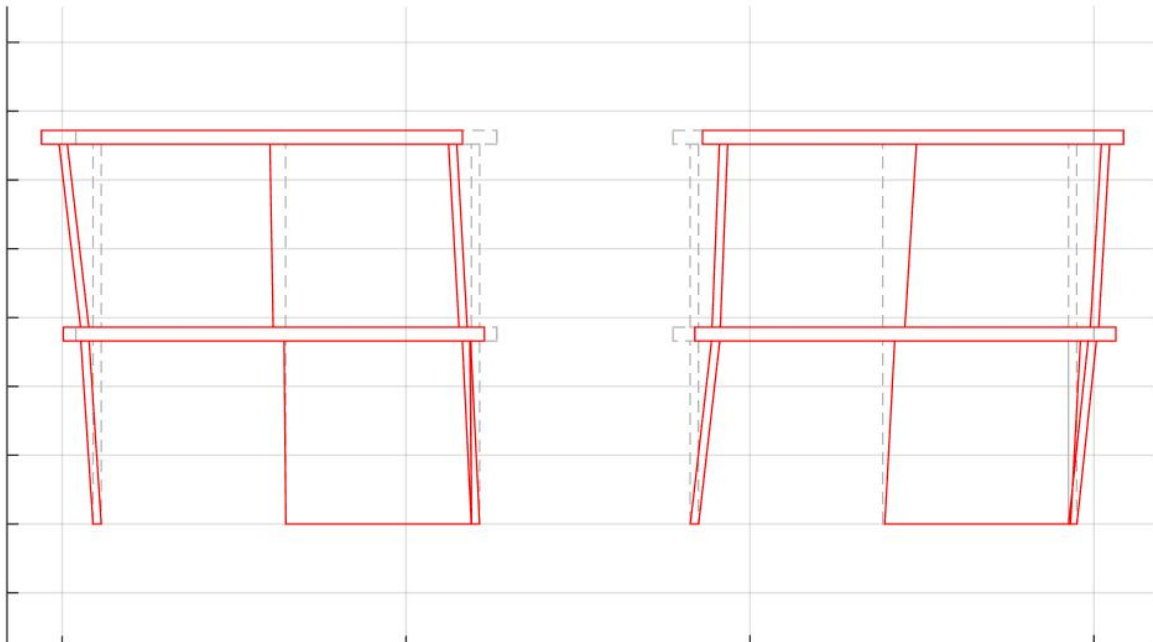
Deformed shape of EUC-BUILD4 retrofitted specimen (max and min) – Test run #3R.
